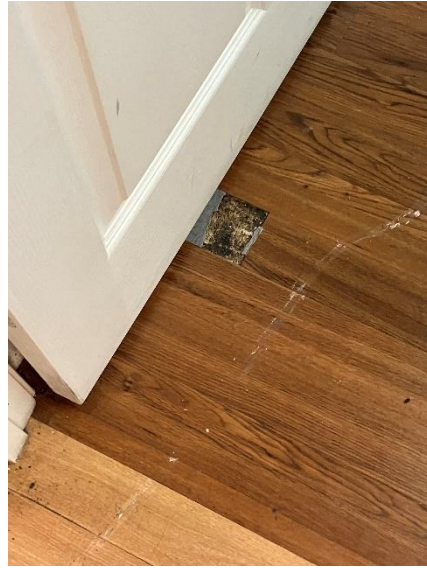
Black and yellow mastic on main floor NE office, middle office, and hallway under dark brown wood flooring
